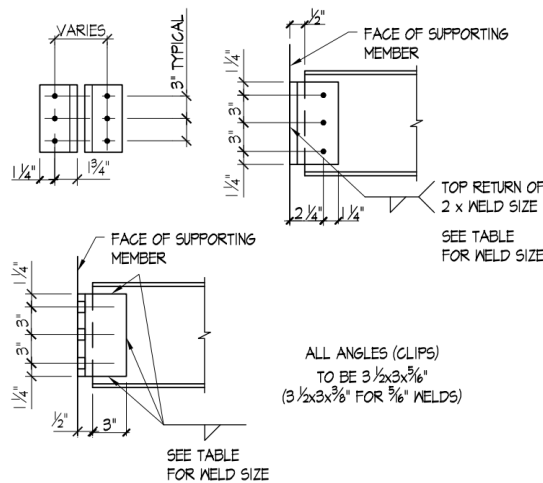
Typical Framed Beam Connections Detail, 1/S2.01
